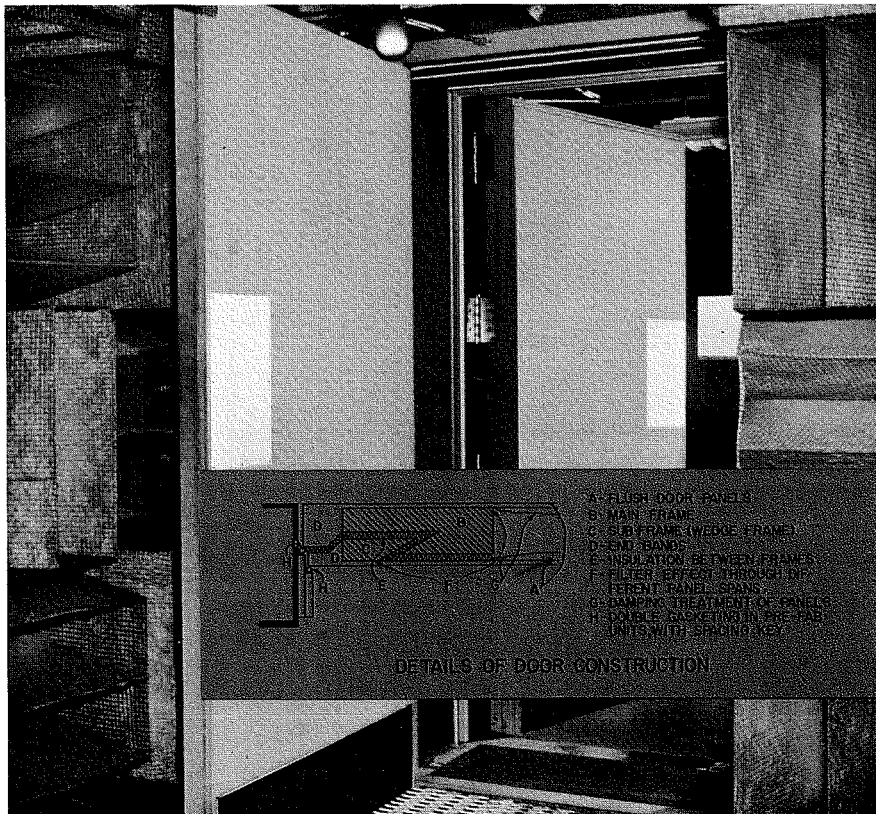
A view from the interior of the TV Division Anechoic Chamber showing the double-door, soundproof construction which employs a dead-air space in between (total depth of doors and air space is about 2 feet). Inset is a sketch showing details of door construction.
